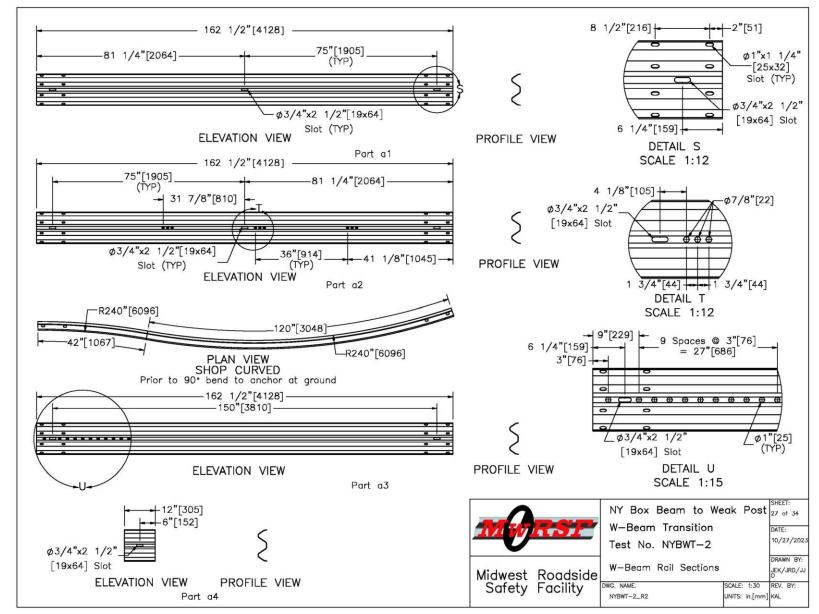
W-Beam Rail Section, Test No. NYBWT-2
